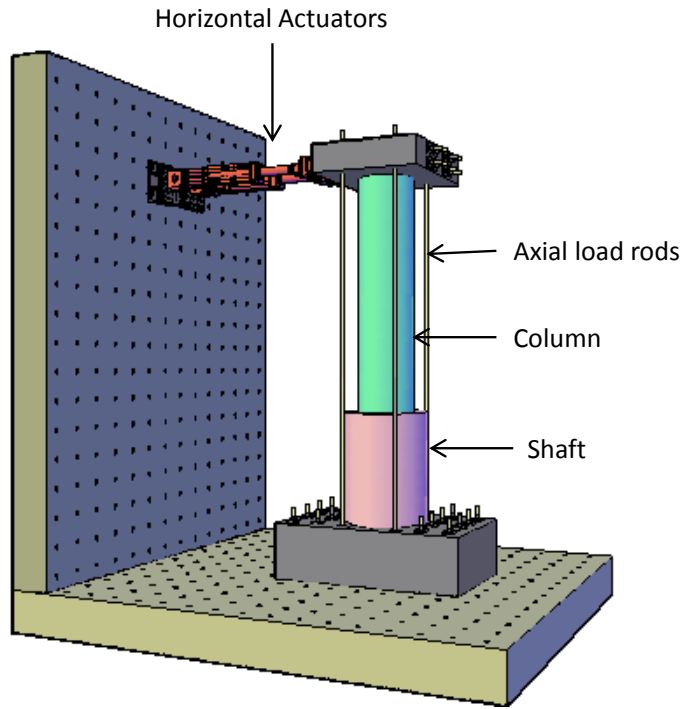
3D view of test setup (Lofizadeh, 2019).
